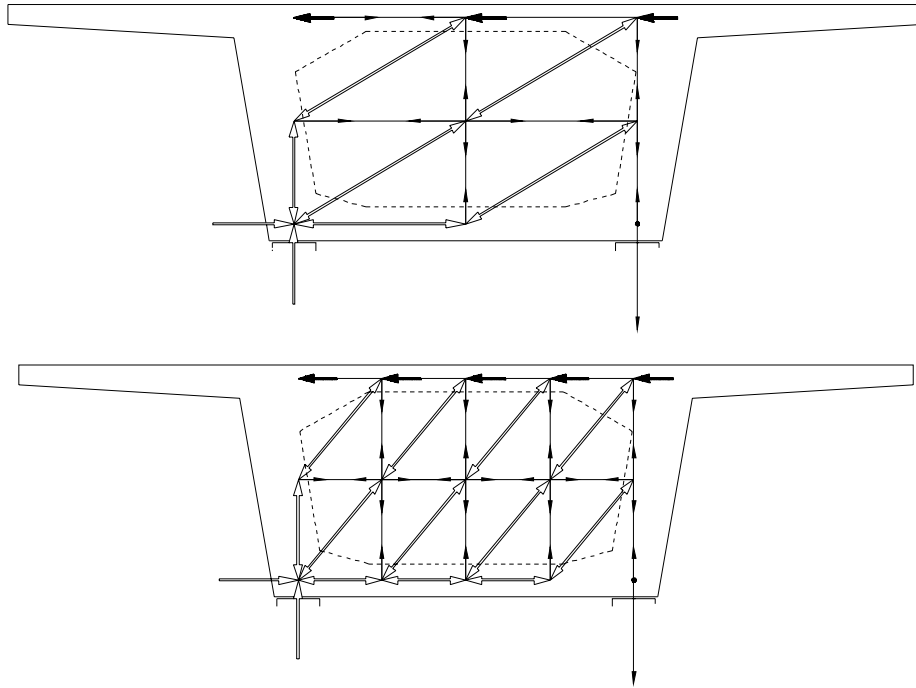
Strut and tie model for a solid type diaphragm without manhole
